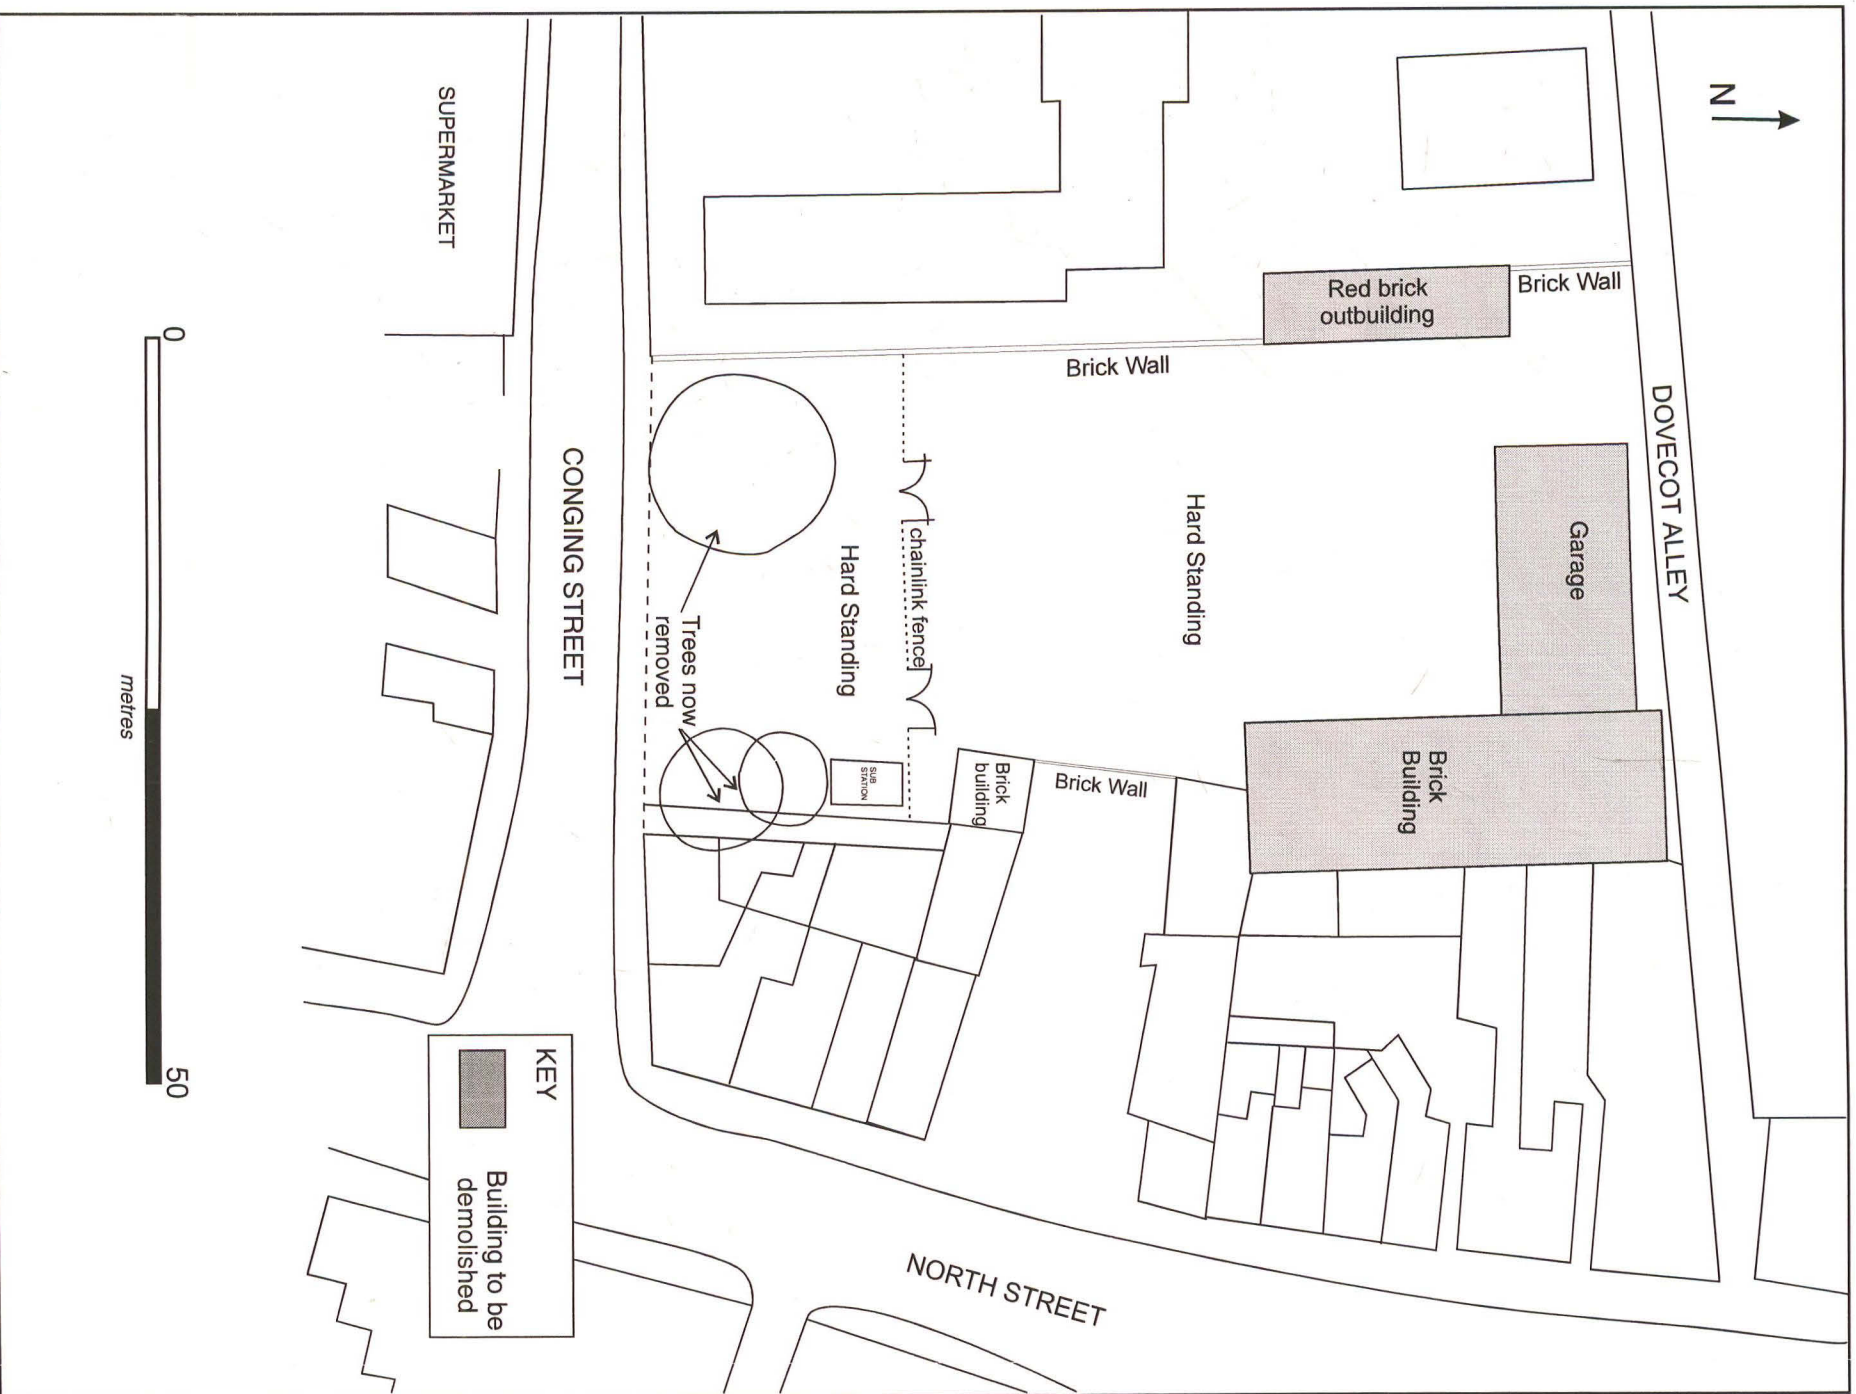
Development site showing layout of buildings between 1980 and 2000
